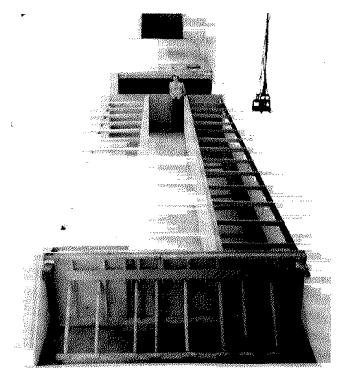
In place photograph of the test section before the addition of the soil layers.
